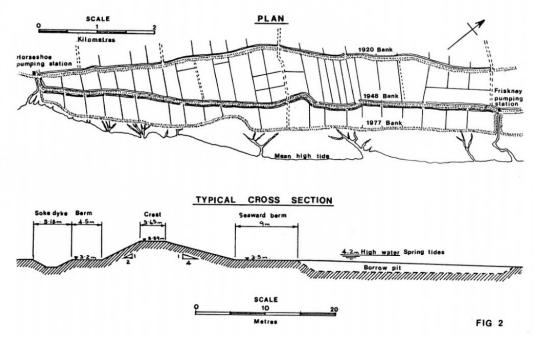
Situation and typical cross-section of reclamations in the Wash (Cook, 1983)
